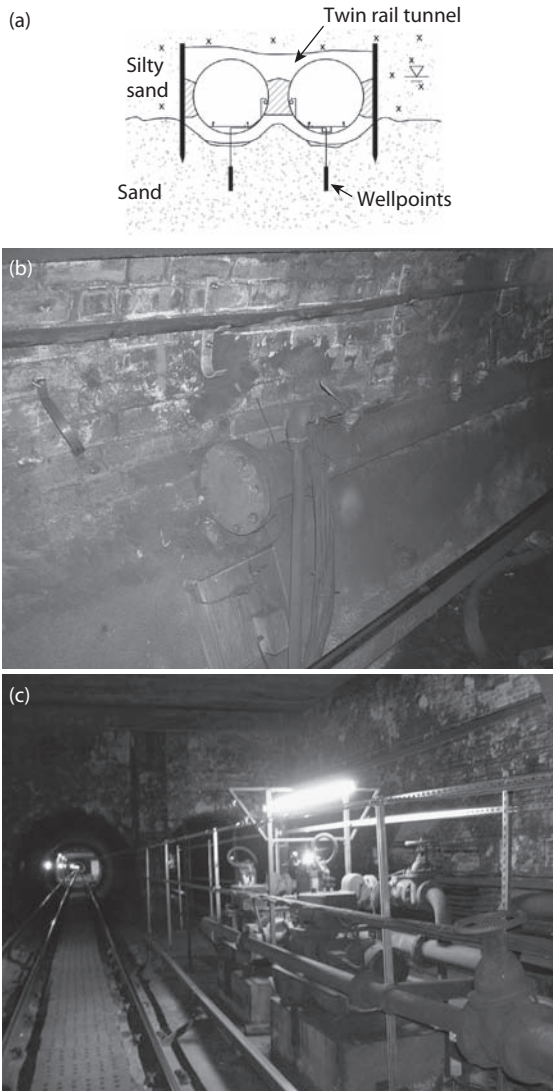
Internal wellpoint system within tunnel. (a) Cross section through an internal wellpoint system. A line of wellpoints is installed through the trackbed of each of the tunnels. The wellpoints are connected to header mains mounted within the tunnels. (b) Wellpoint header main mounted on internal face of railway running tunnel. The flexible connecting pipe to one of the wellpoints is visible in the foreground. (c) Wellpoint pumps within the tunnel. Electrically driven duty and standby wellpoint pumps are situated in an existing space at one end of the tunnels. The railway tracks and one of the tunnels are visible in the left of the picture. (Courtesy of Strathclyde Partnership for Transport, Glasgow, U.K.)
